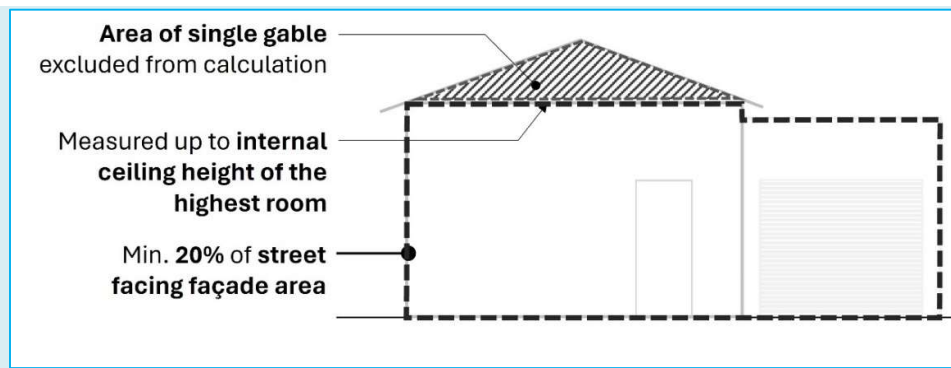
a: Street facing façade area – single storey unit
